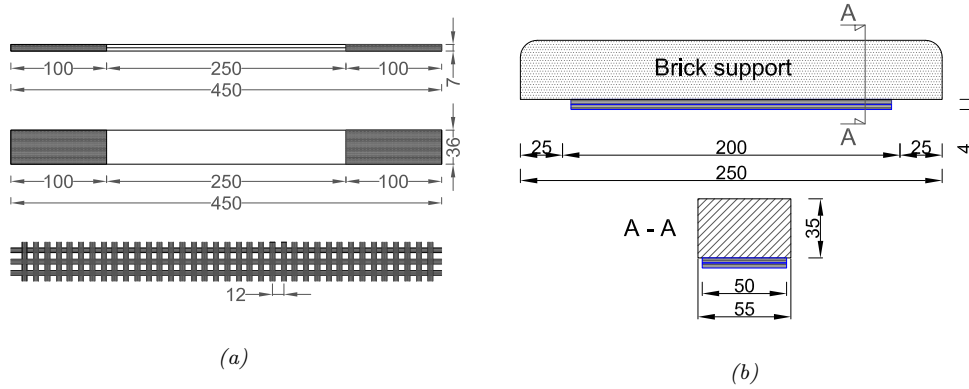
Specimen geometry (dimensions in mm): (a) rectangular coupons for uni-axial traction test and (b) three-point bending of laminated bricks
